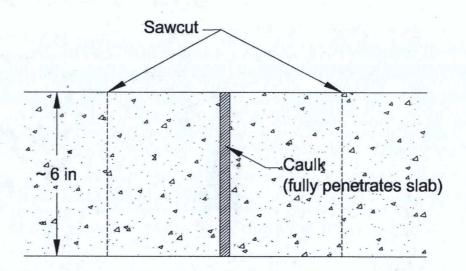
Section of Typical Joint in Concrete Pavement in 2-10 Area (not to scale)
